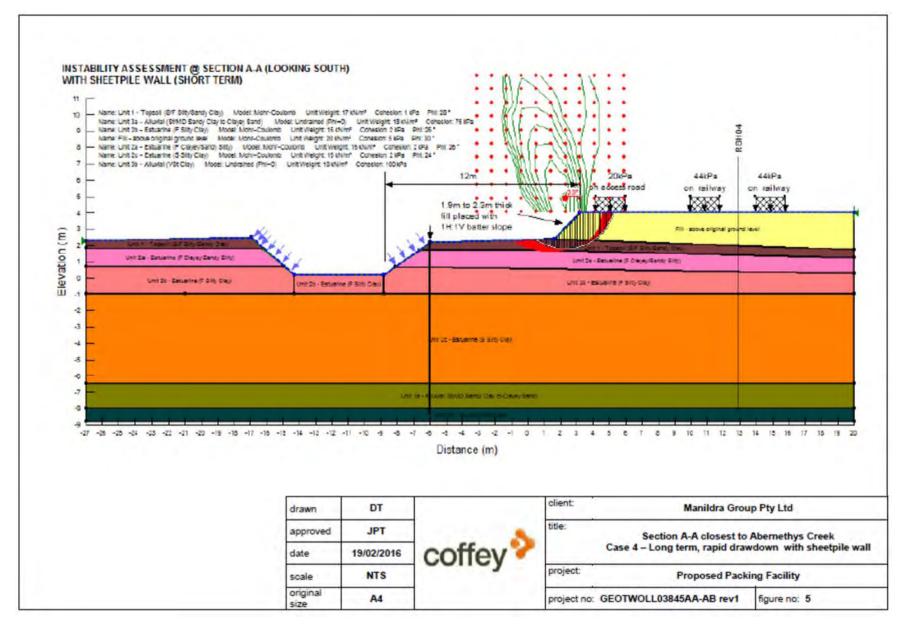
Case 4 – Long term, rapid drawdown with sheetpile wall (extract Figure 5 – Coffey's Geotechnical Assessment)
